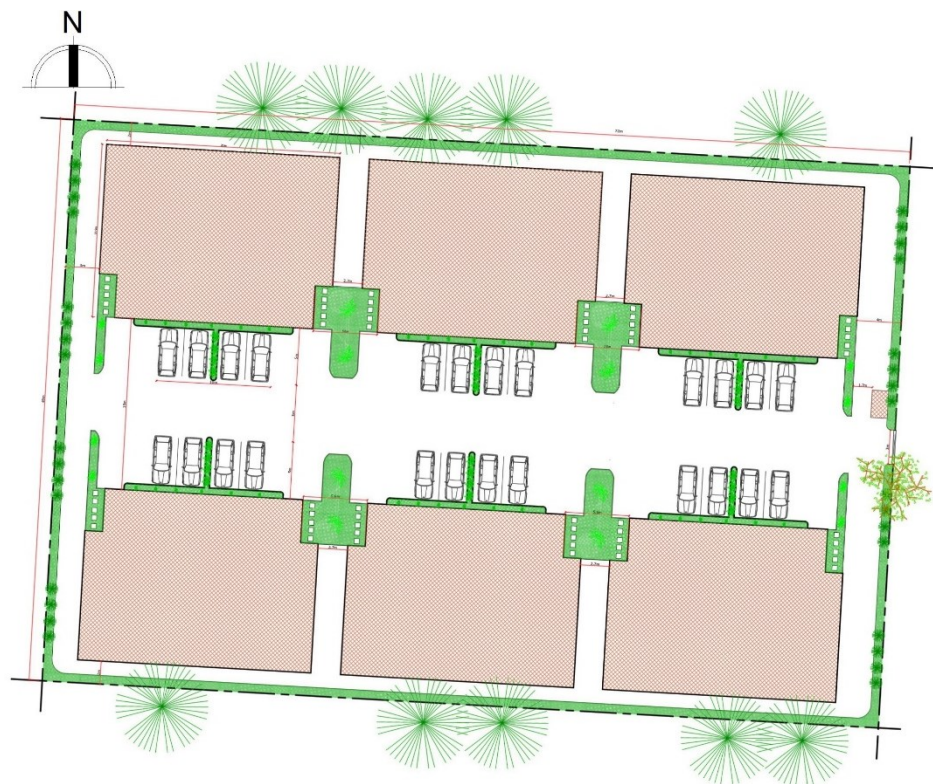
Site Plan of Case Study Three (Leptons Planet Five)
